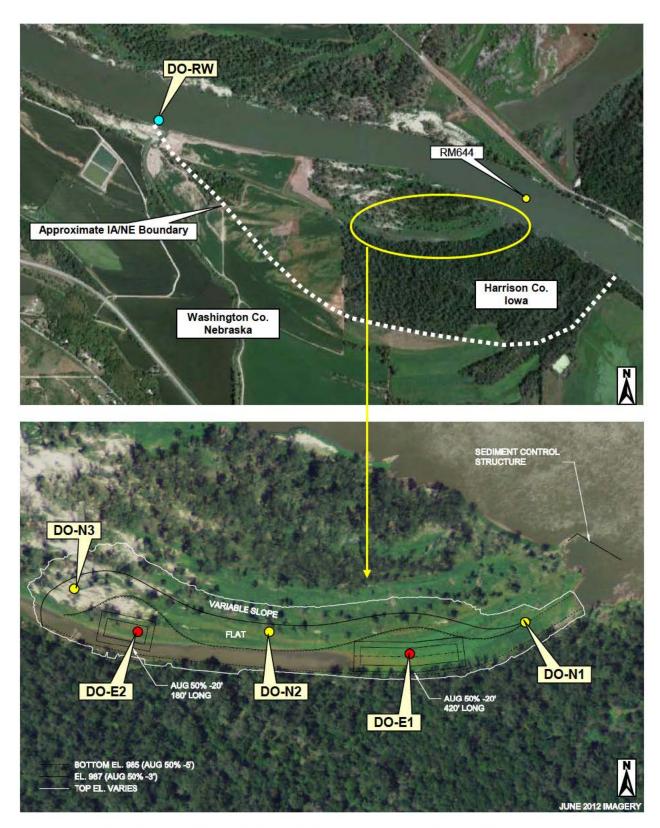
Proposed area for excavation to enhance and expand the existing backwater at the Desoto project site. (Shown on June 2012 Google Earth imagery.)
